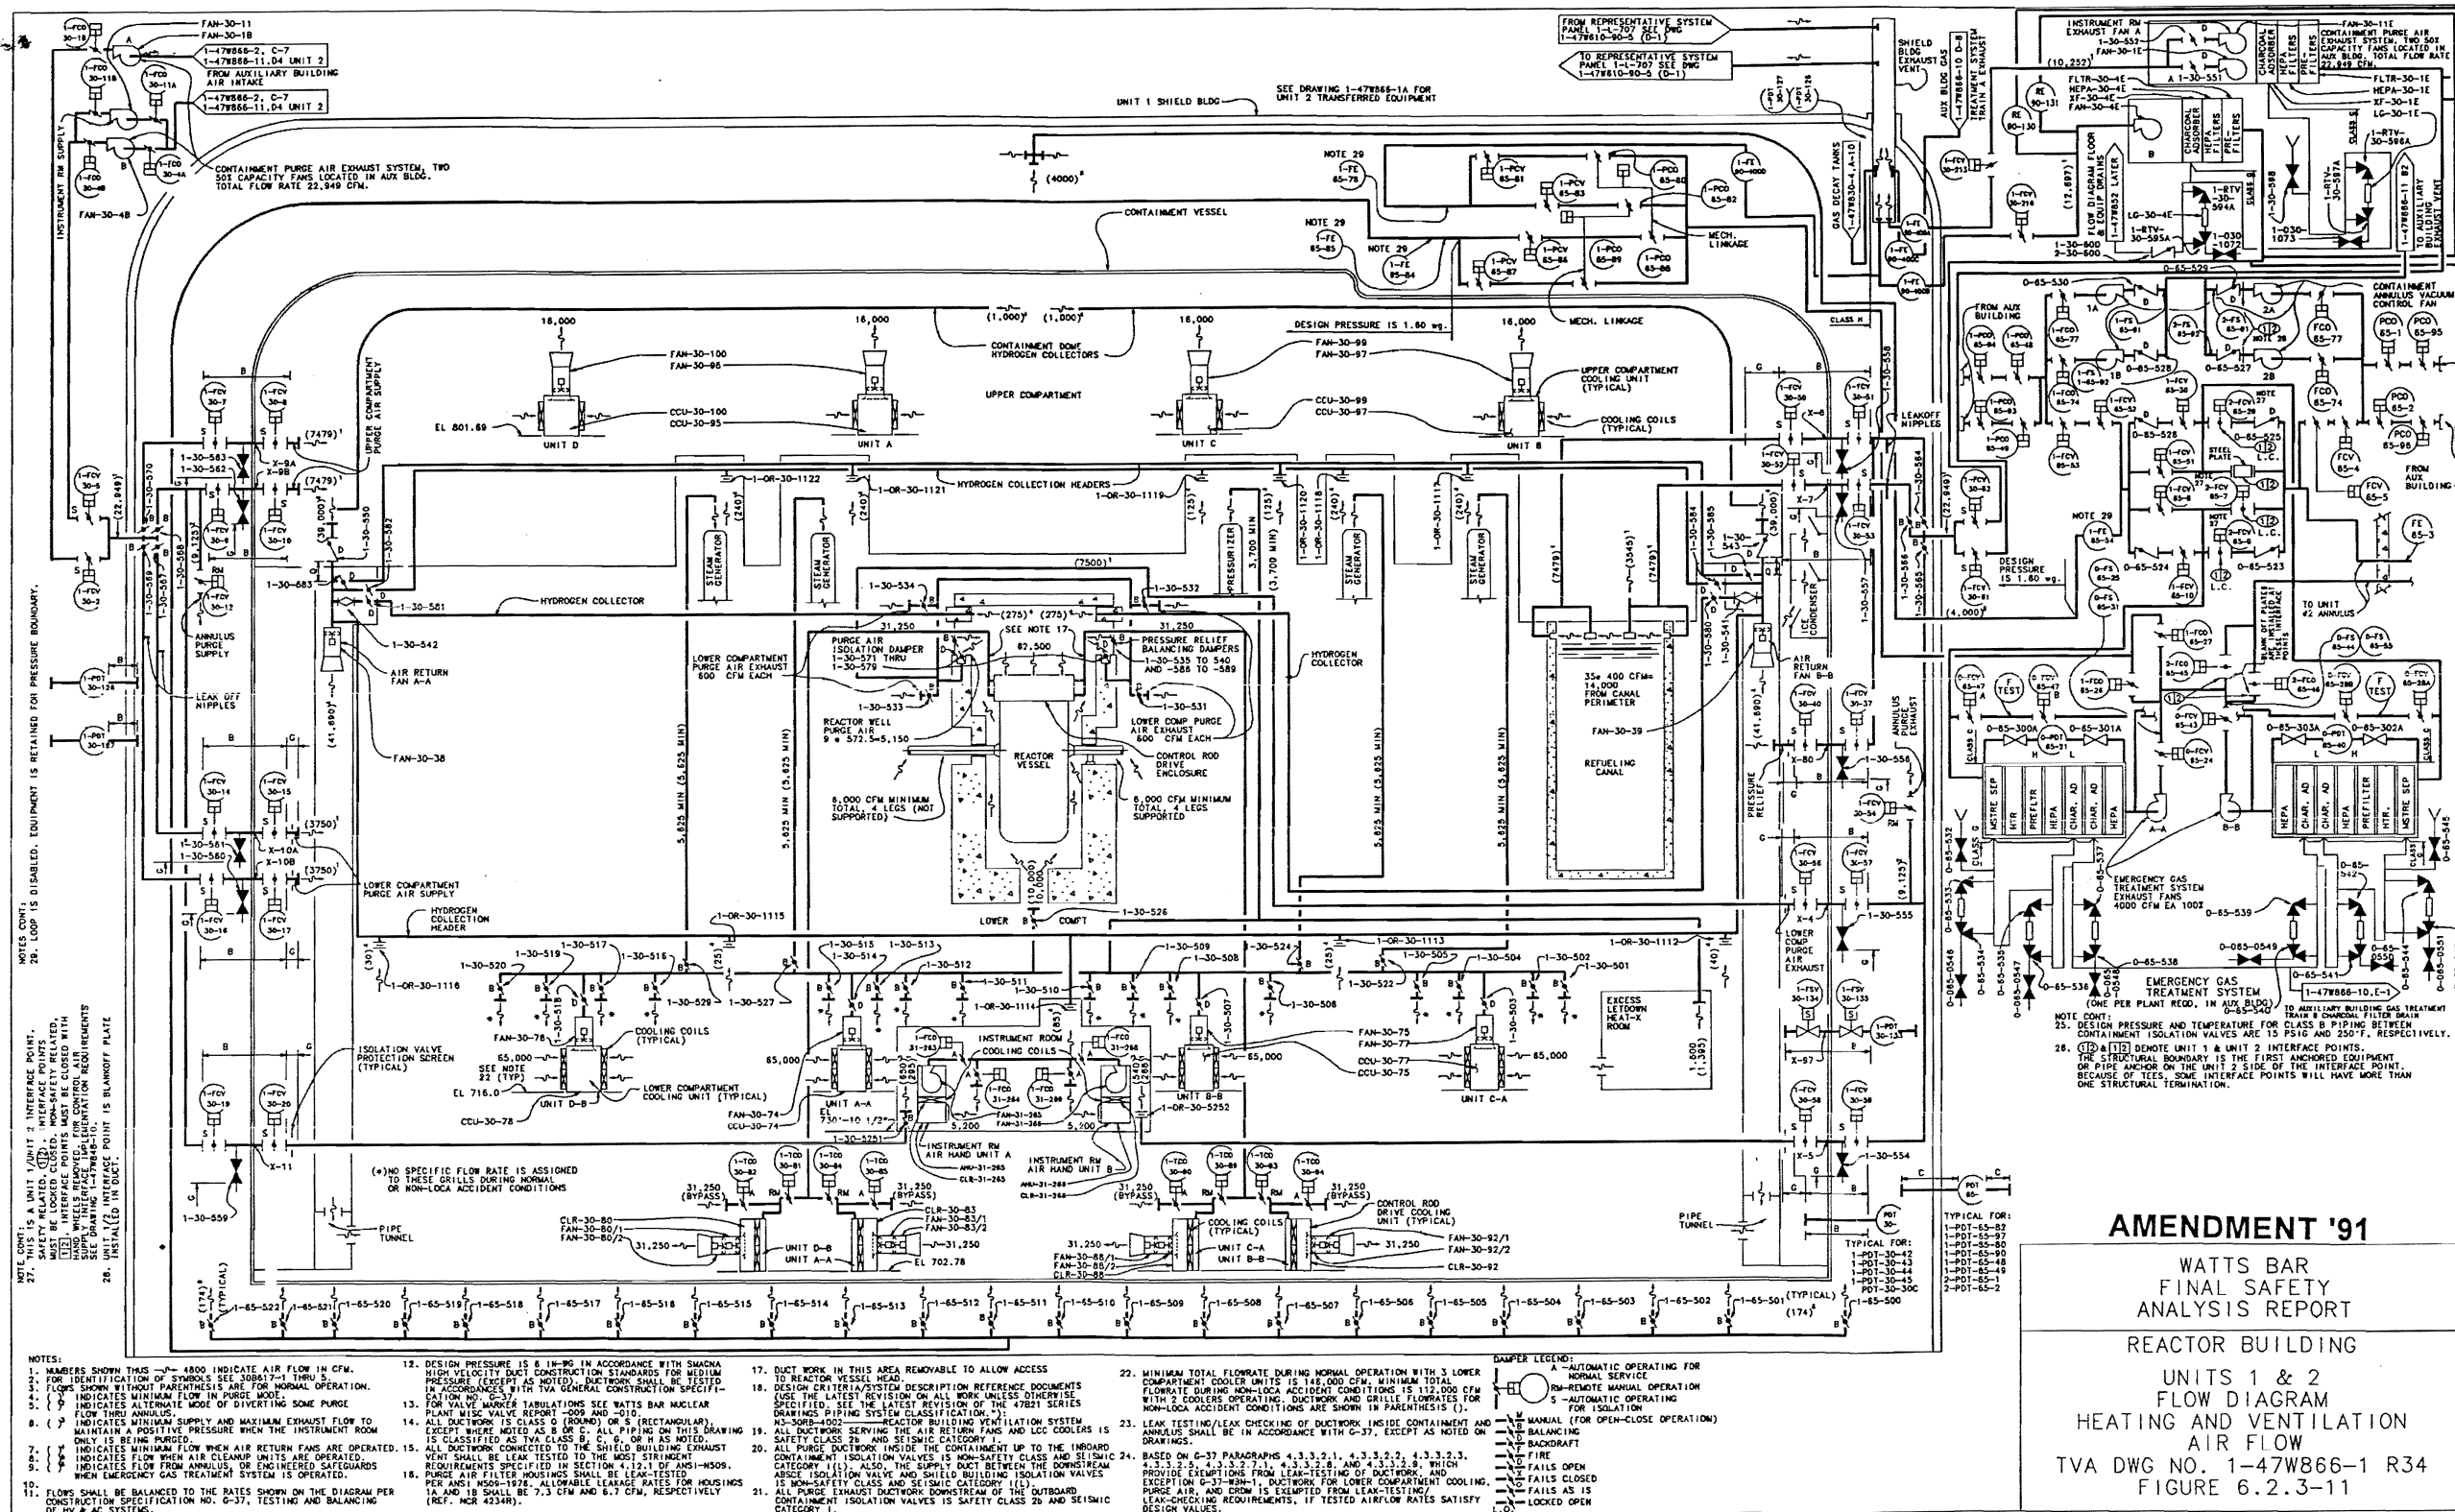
Reactor Building - Units 1 & 2 Flow Diagram - Heating and Ventilation Air Flow
